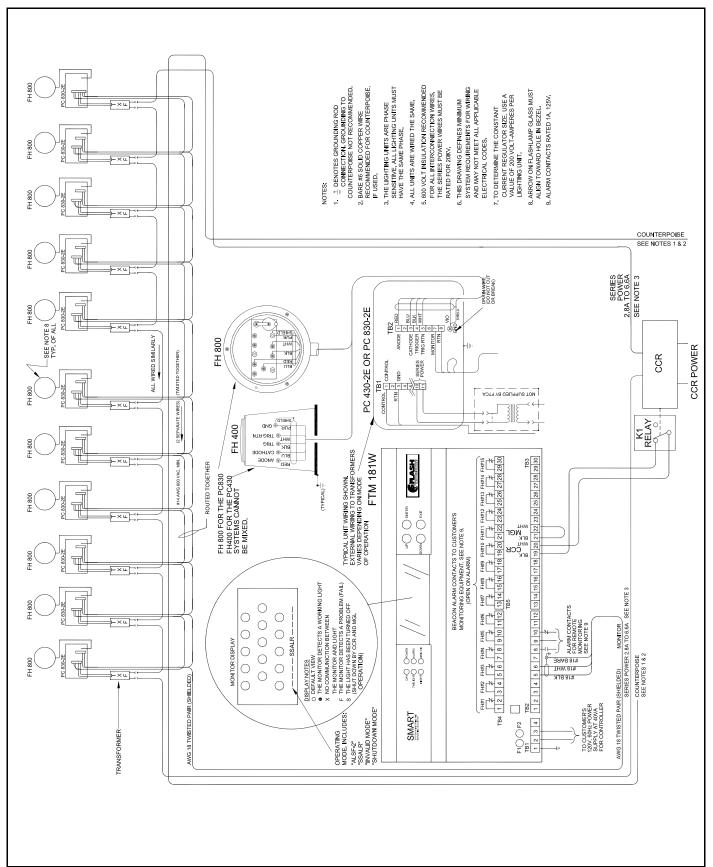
Typical FTS 430/830-2E System Installation Wiring
